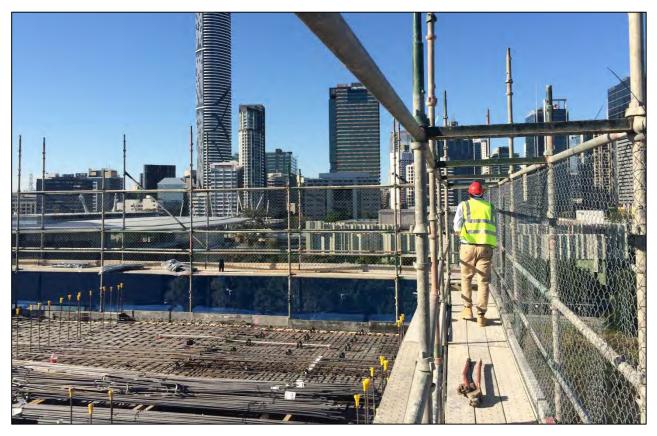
Level 9 – Reinforcing now complete ready for the level 9 slab pour.
